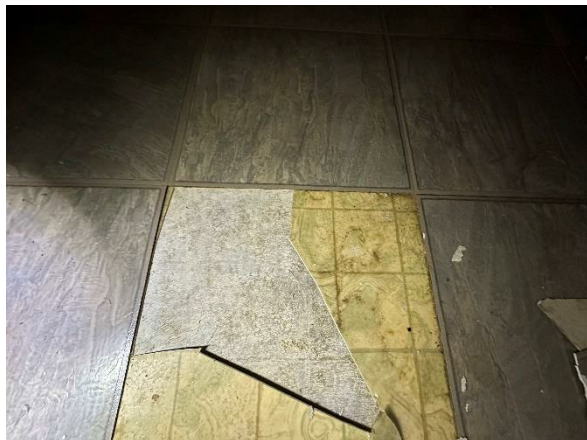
HA-11: Yellow sheet flooring with adhesive (Under HA-10)
